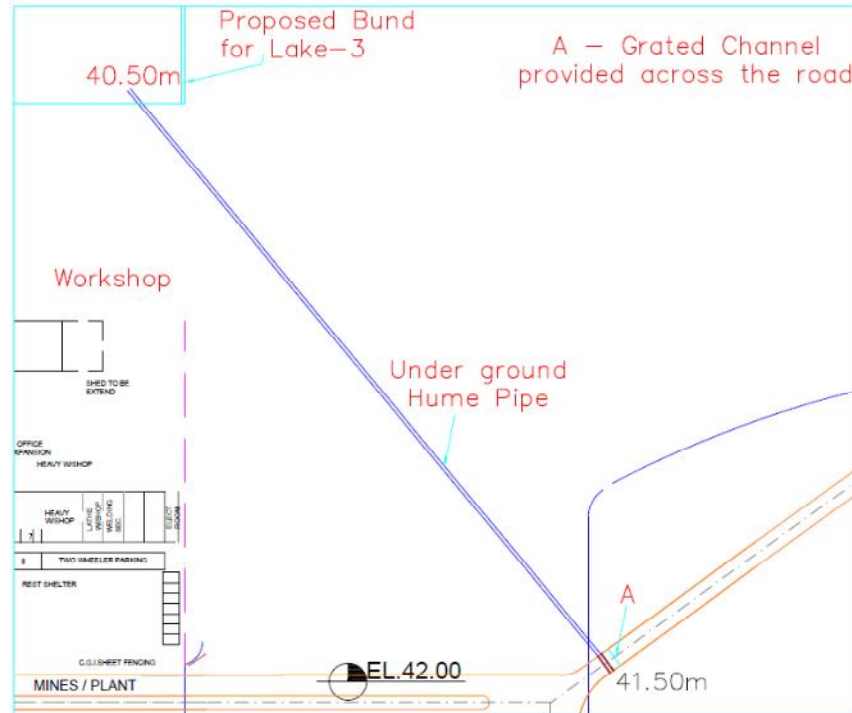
Details of underground Pipe and Grated channel from Colony Road to Lake-3
